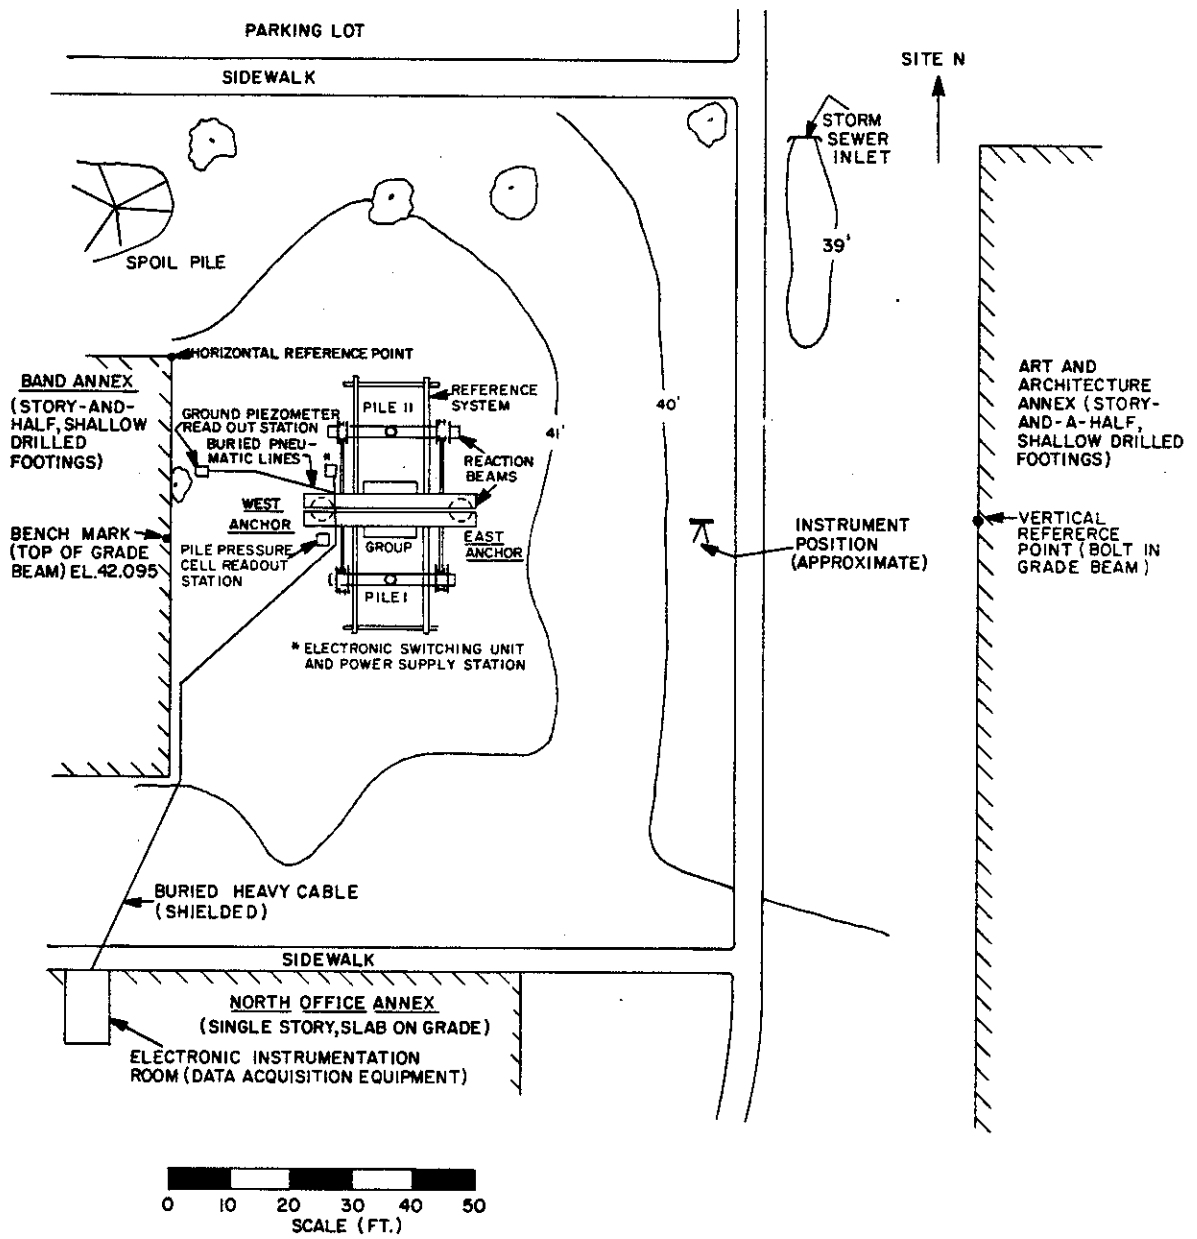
GENERAL SITE LAYOUT (1 ft = 0.305 m)
